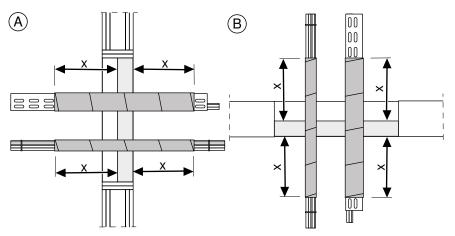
Fire protection bandage FSB-WB 1.5 on cables on wall (A) and ceiling (B)
